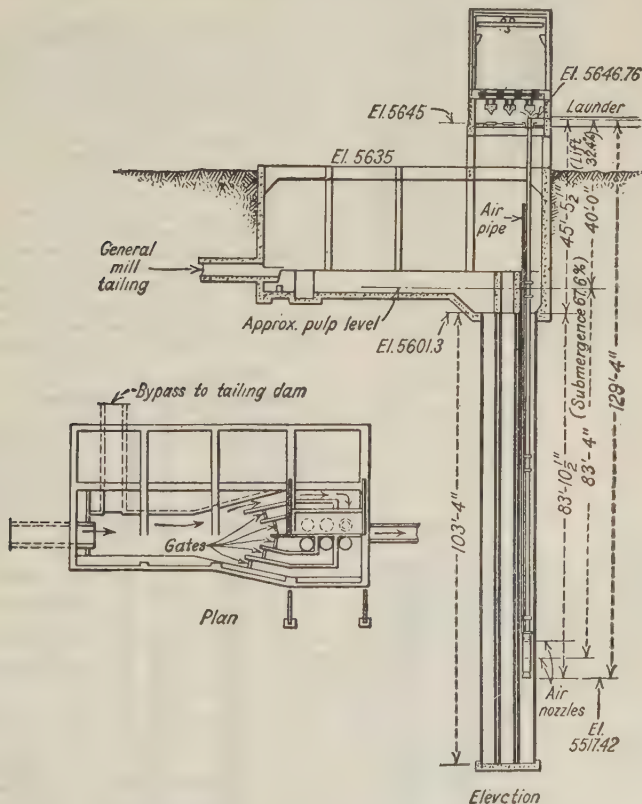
Arrangement of tailing air-lift at Chino Copper Co.
